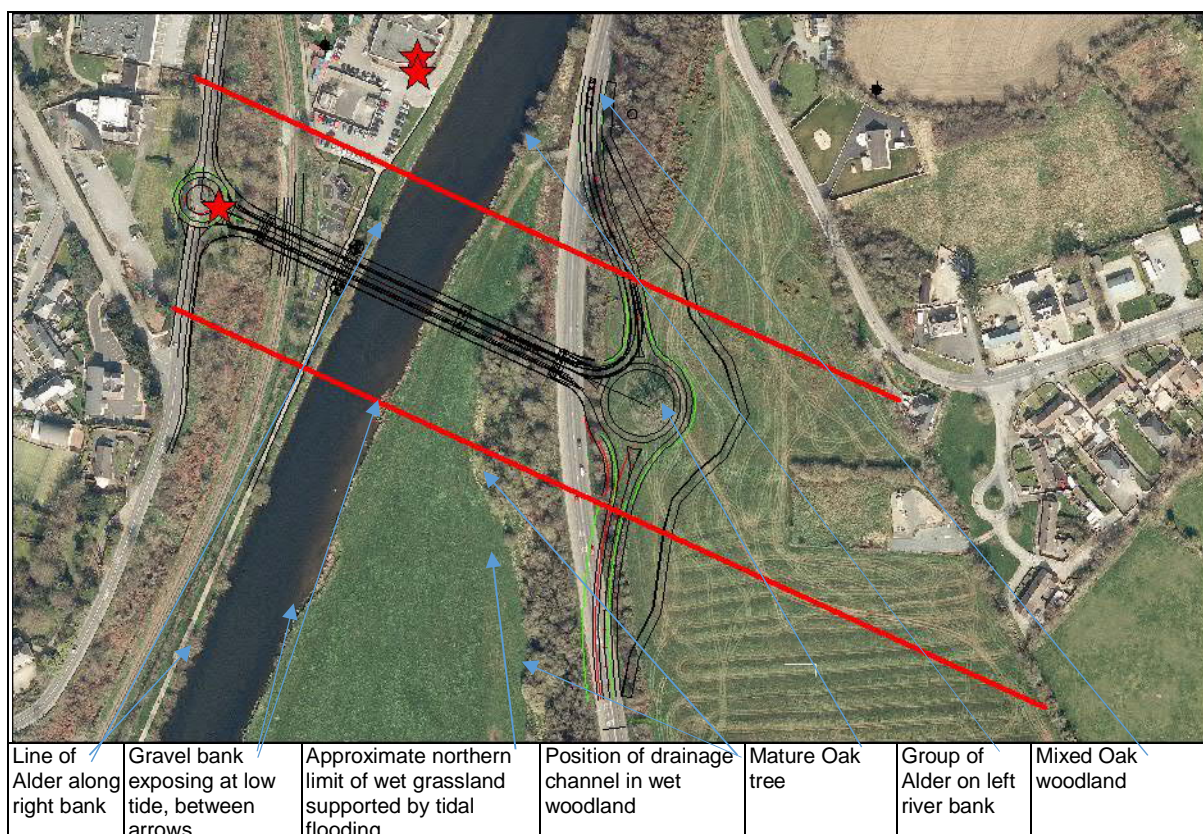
Details of Vantage Point watches at proposed new bridge location.
